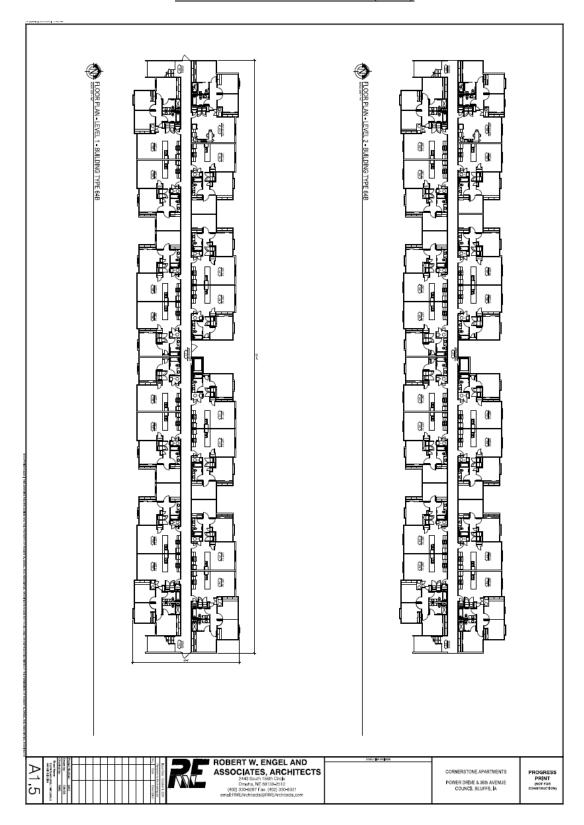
PROPOSED FLOOR PLANS
